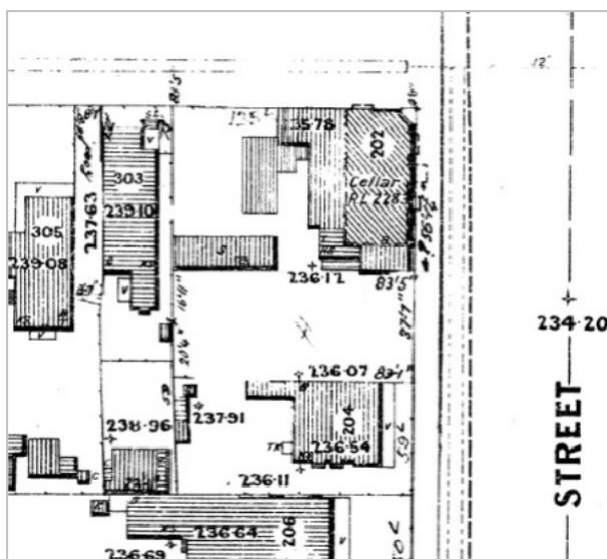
Detail from a Ballarat sewerage plan dated 1927, showing the footprint of the building and stables at the rear. (Source: PROV)
